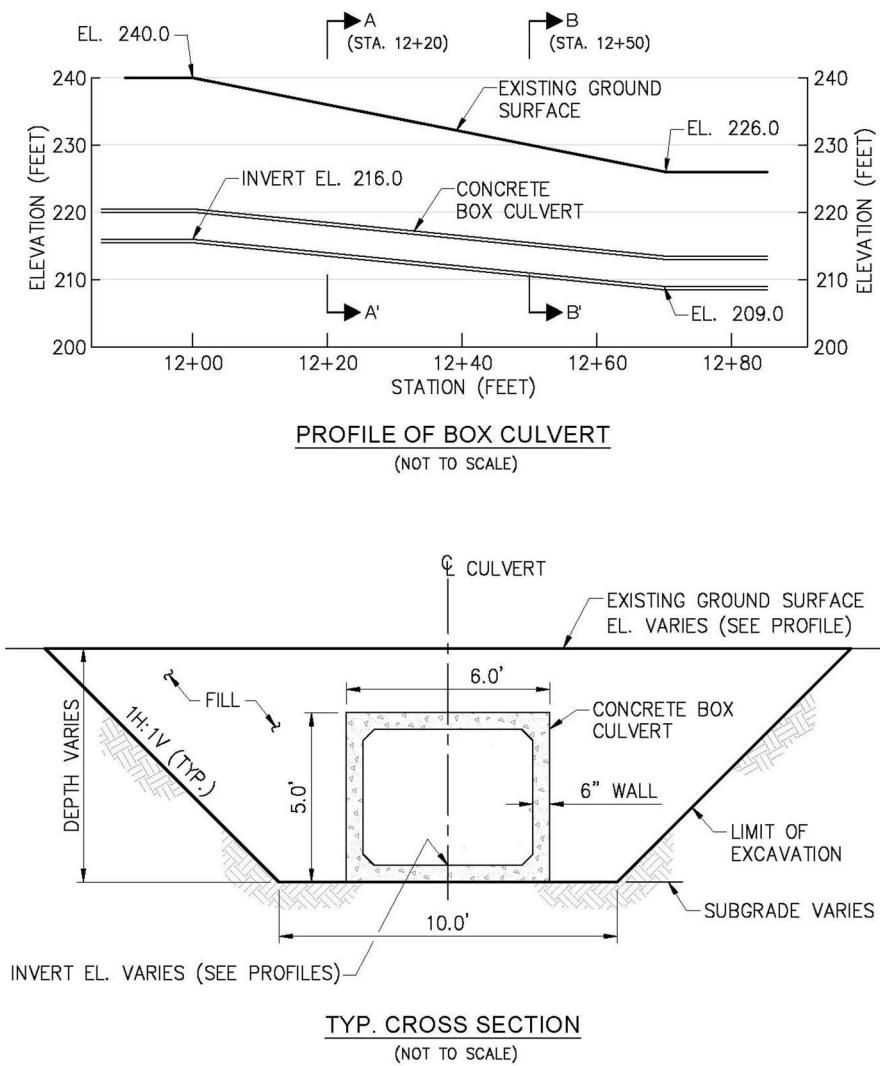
P-4. Profile and Typical Cross Section of Box Culvert
